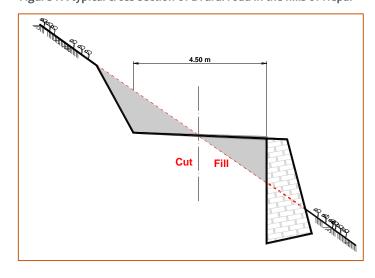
A typical cross-section of a rural road in the hills of Nepal
